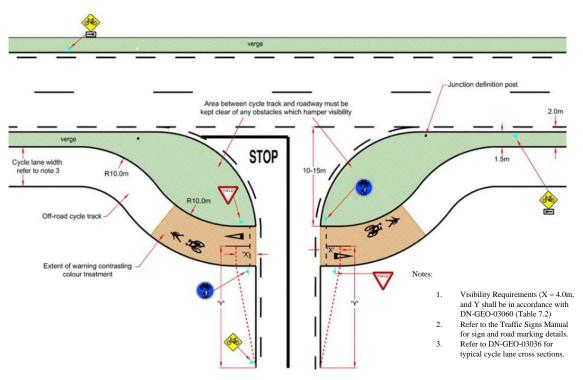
Bend Out Crossing (minor road AADT <4,000)
